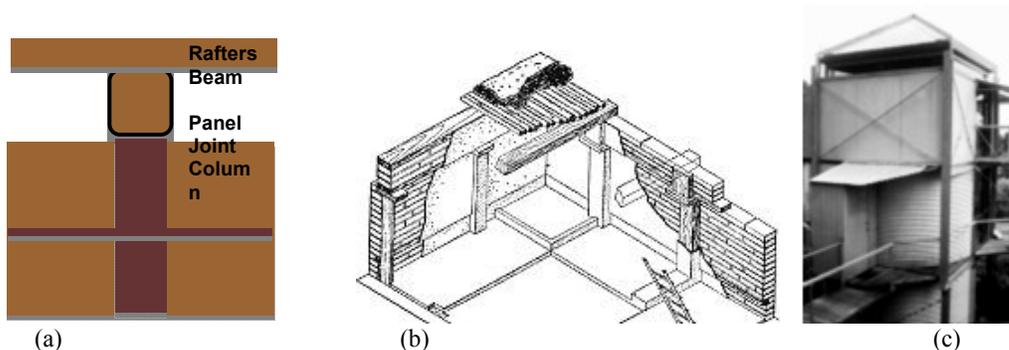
Principles of the Structural System: (a) Inferred Mellaart roof beam section; (b) Reconstruction of typical Çatal building Level VI (Mellaart, 1967 in Hodder, 2005); (c) External steel frame tower (Ganis, 1998)
